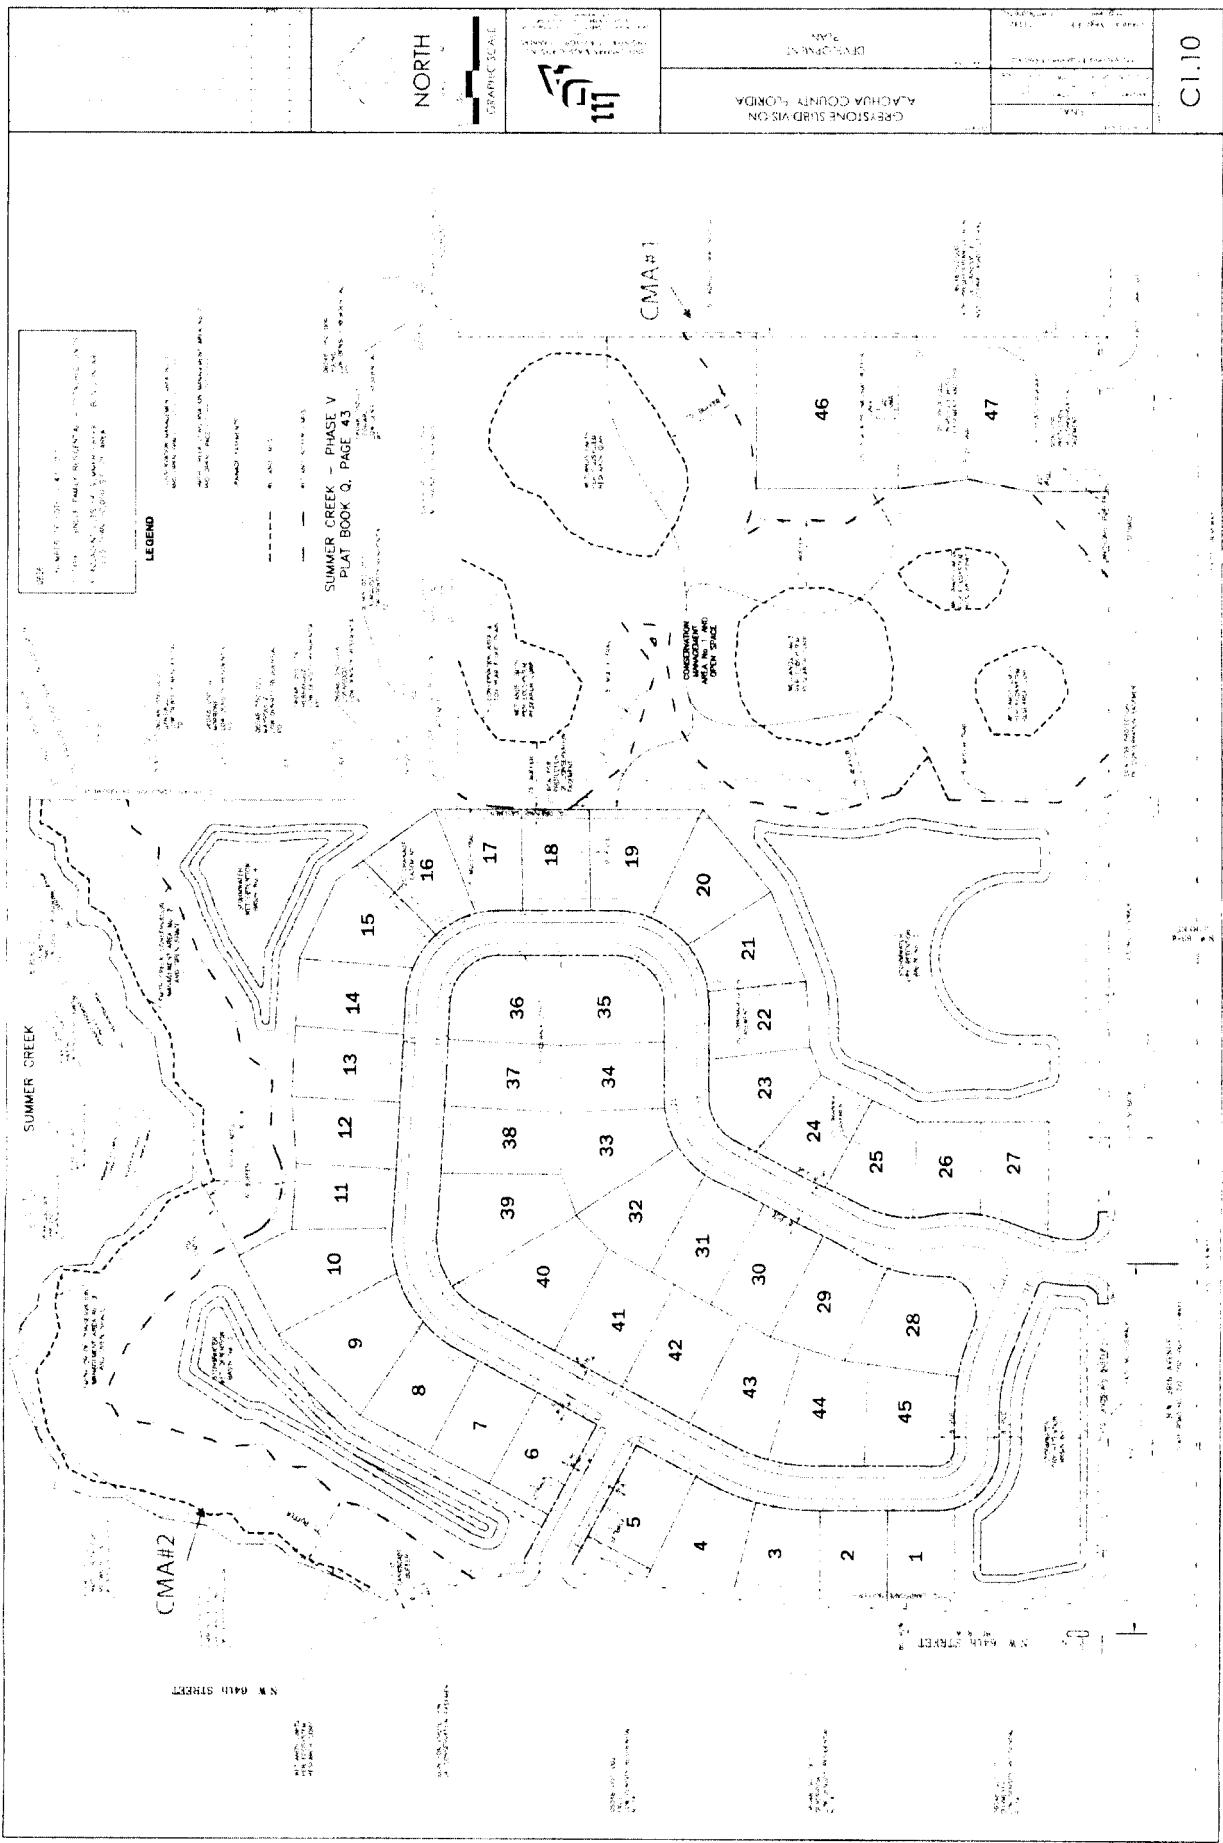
Site development plan for the Greystone Subdivision showing locations of primary open space areas consisting of (1) Conservation Management Area No. 1 and Open Space and (2) Smith Creek Conservation Area No. 2 and Open Space
